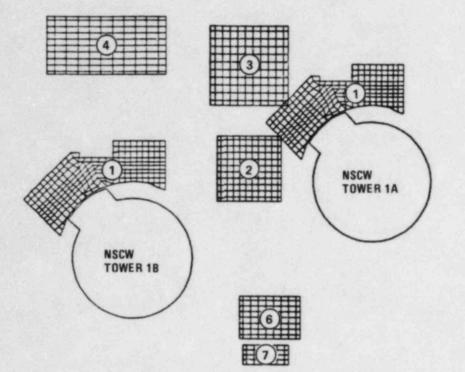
EQUIPMENT LOADS AT FAN DECK LEVEL
